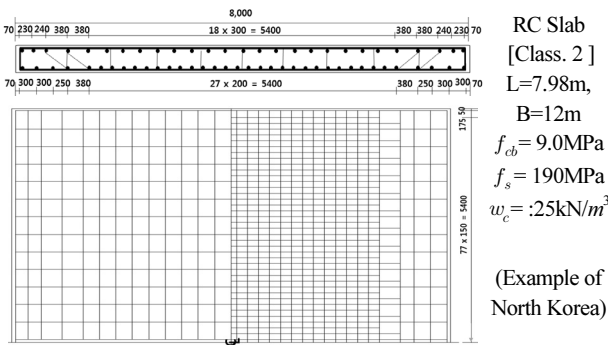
Bar Arrangement Drawing of Standard RC Slab Bridges
